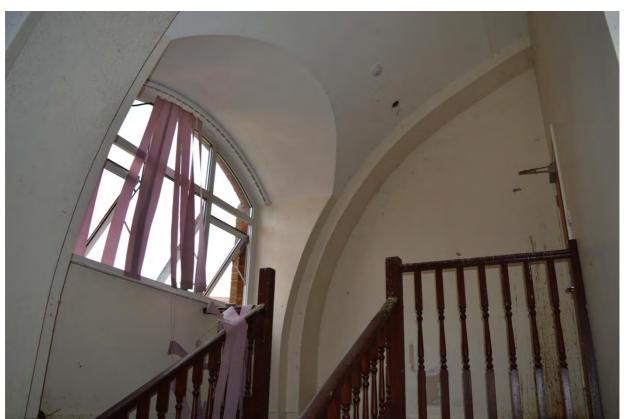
Building 6, first floor stairwell, detail of arched plaster ceiling obscured by later insertions, facing south-east (7335_0136)
